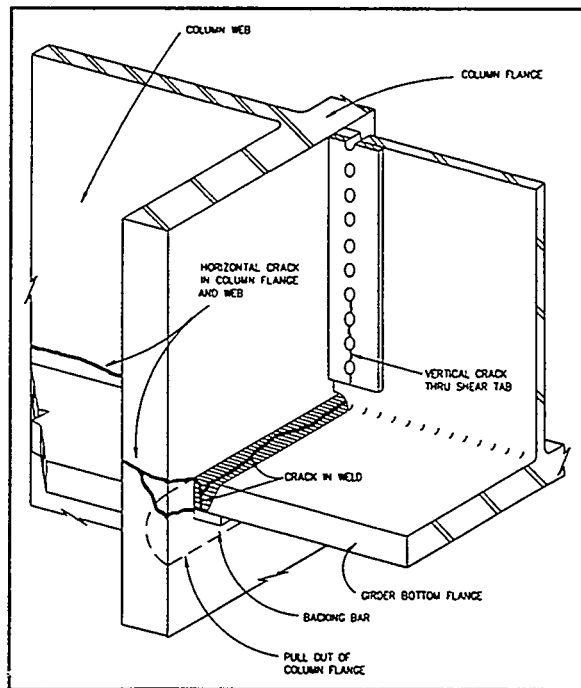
Enlarged detail of Welded-flange, bolted-web connection damage [ref 3].
